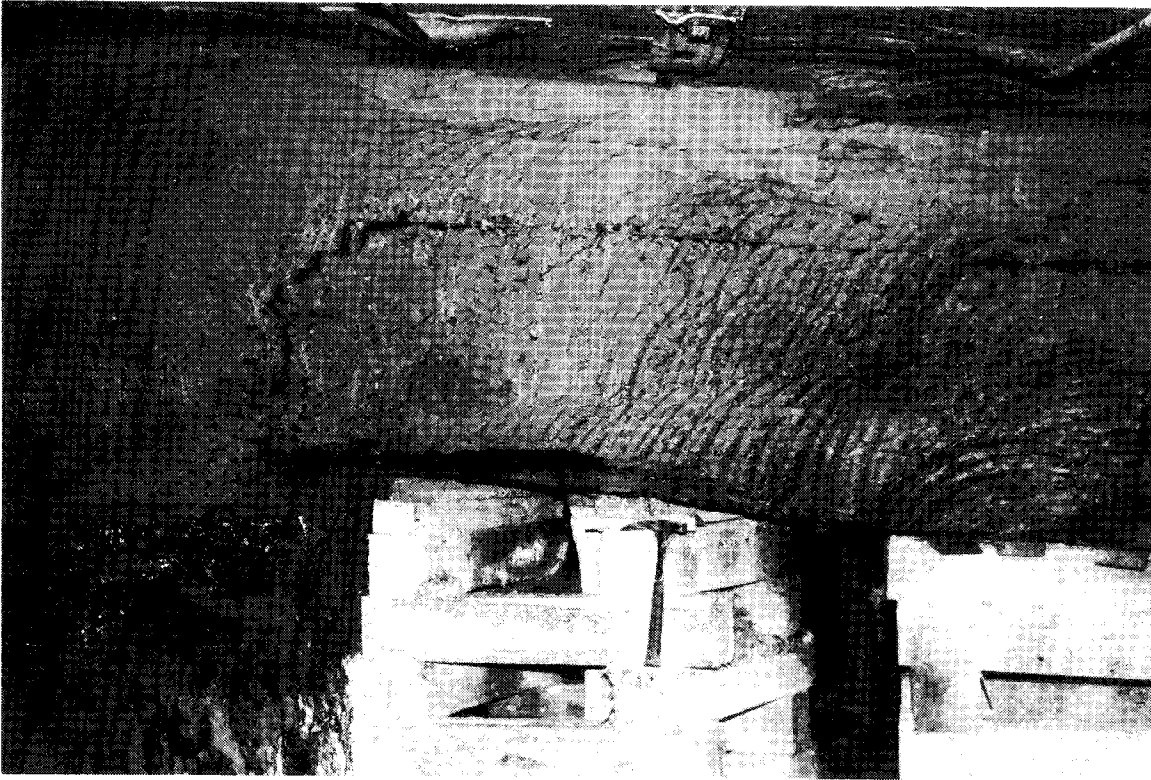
Initial propagation of cutter roof failure to a weak bedding plane in roof rock above a crosscut.
